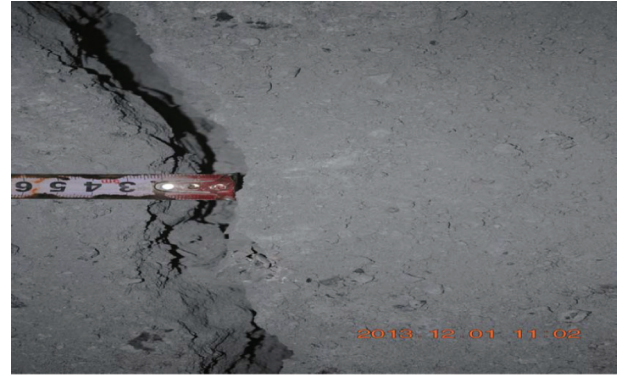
Detailed drawings of cracks in side walls.
